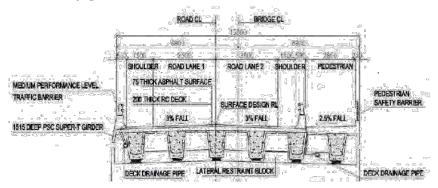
Superstructure Option 1 – Cross section with Super-T beams on Road A, C and D
